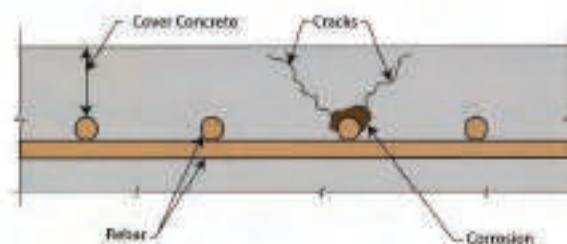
Typical Reinforced Concrete Deck and Slab Deterioration
